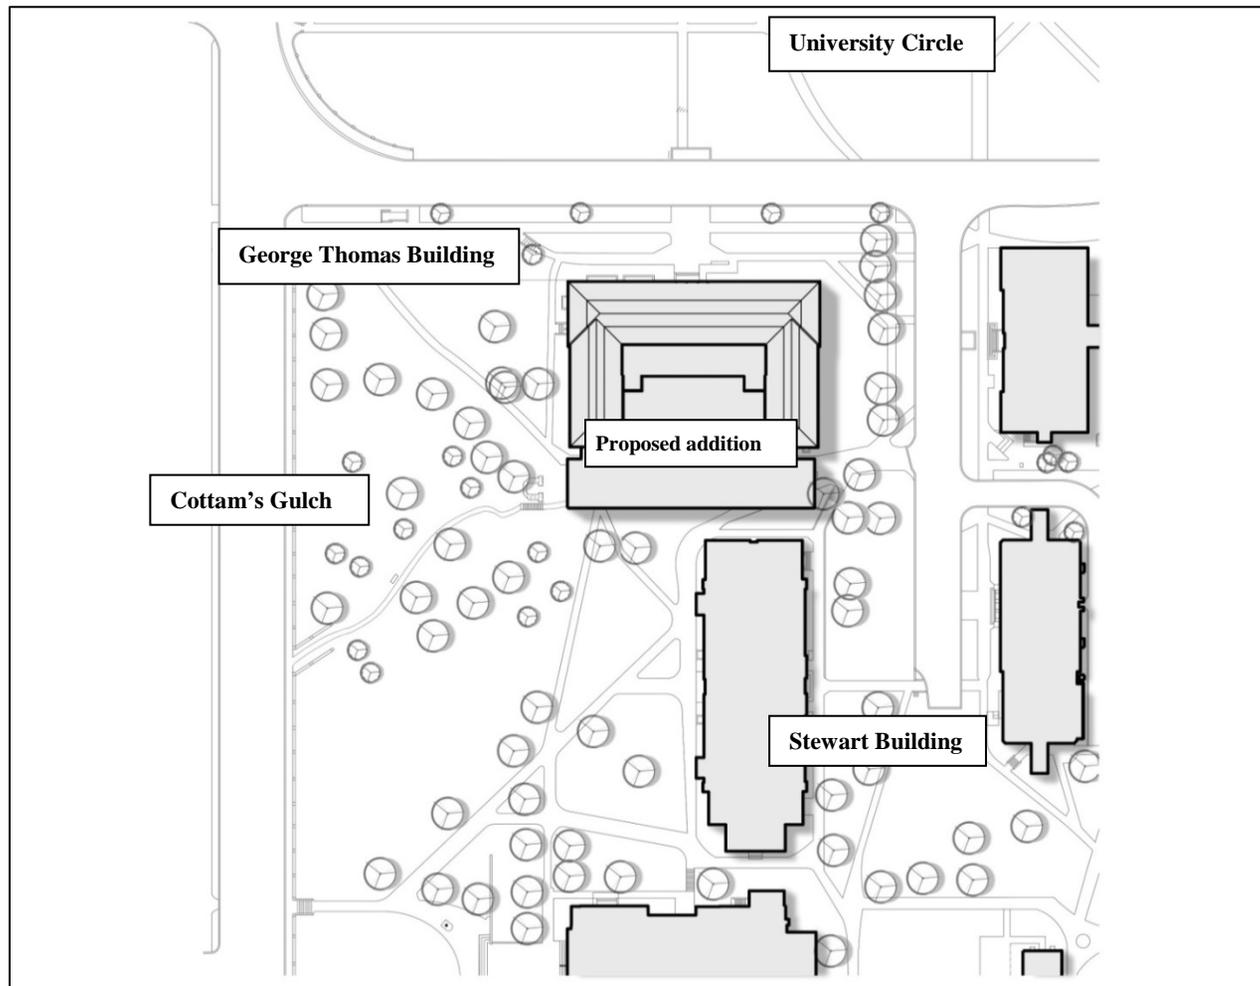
Proposed site plan as prepared by EDA Architects, 2013.
